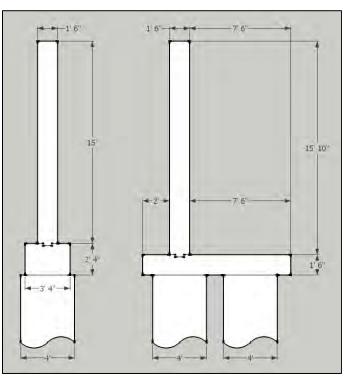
Original Wall Design (left), Retaining Wall Design (Right)
